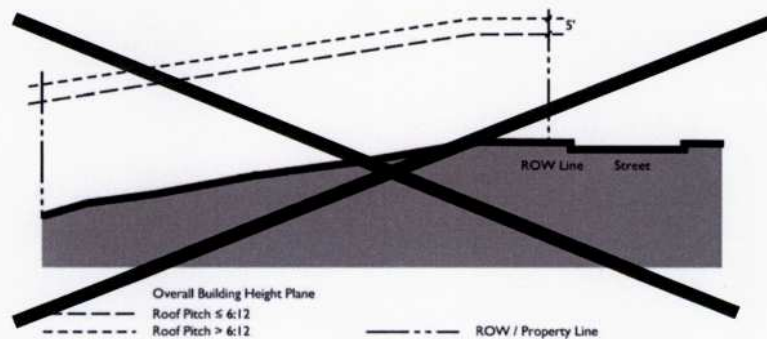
B. Pitched roof building height measurements (not drawn to scale).
